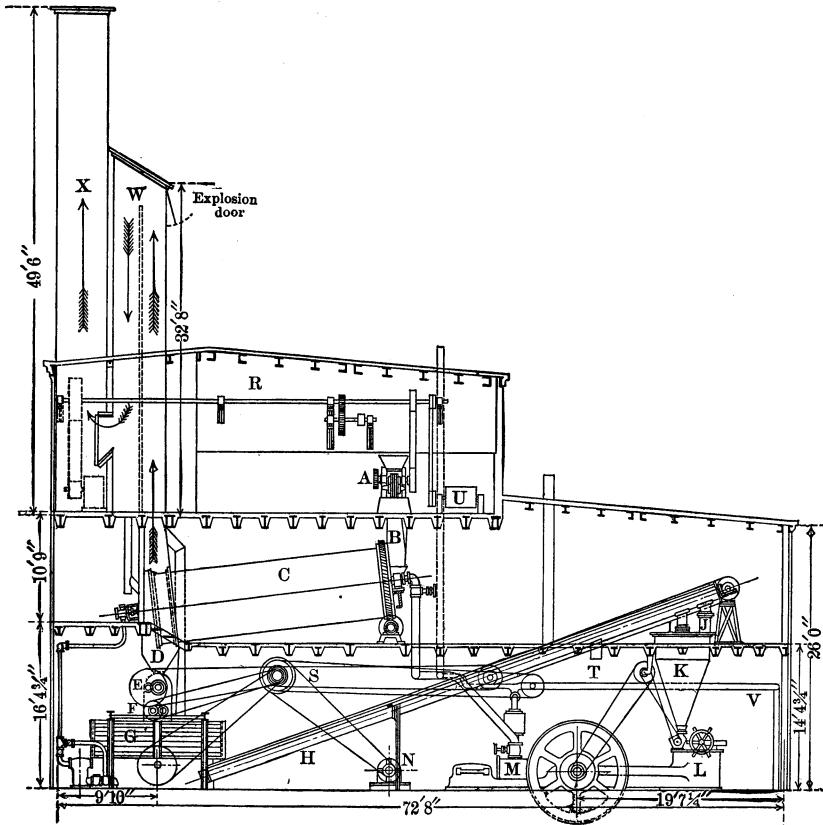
Longitudinal section of lignite-briquetting plant.
